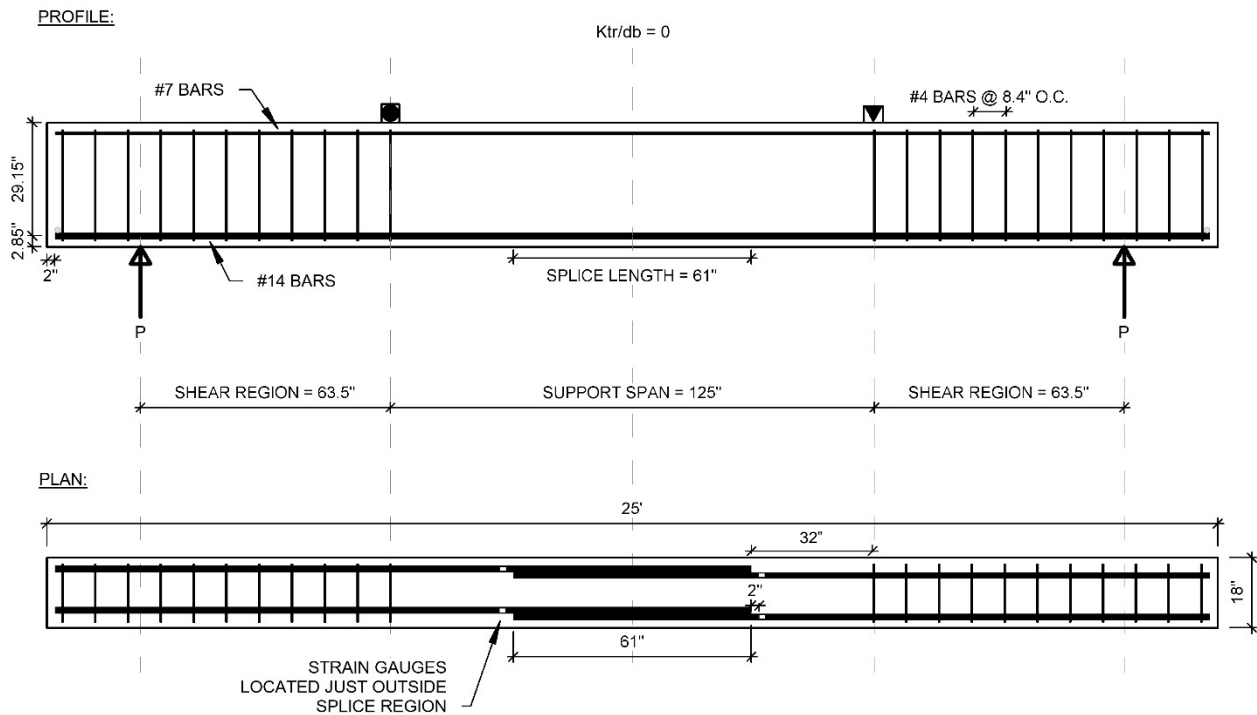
Profile and plan of 14-a (1 in. = 25.4 mm)
